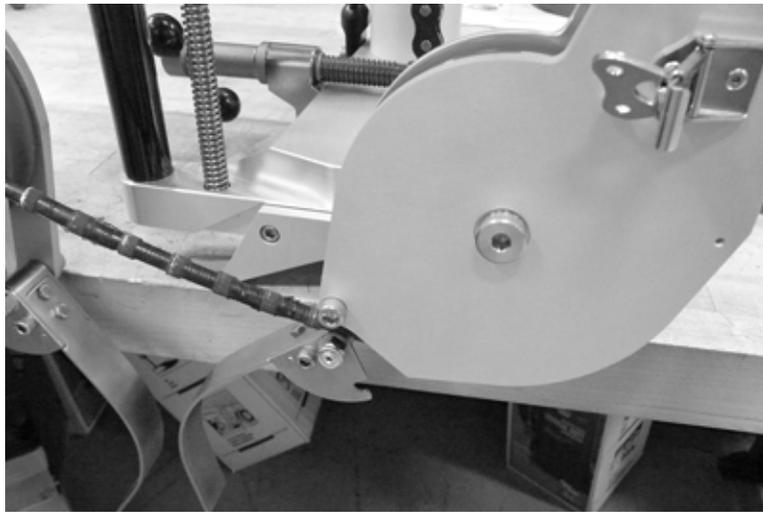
New cutting wires have a label indicating the cutting direction.
